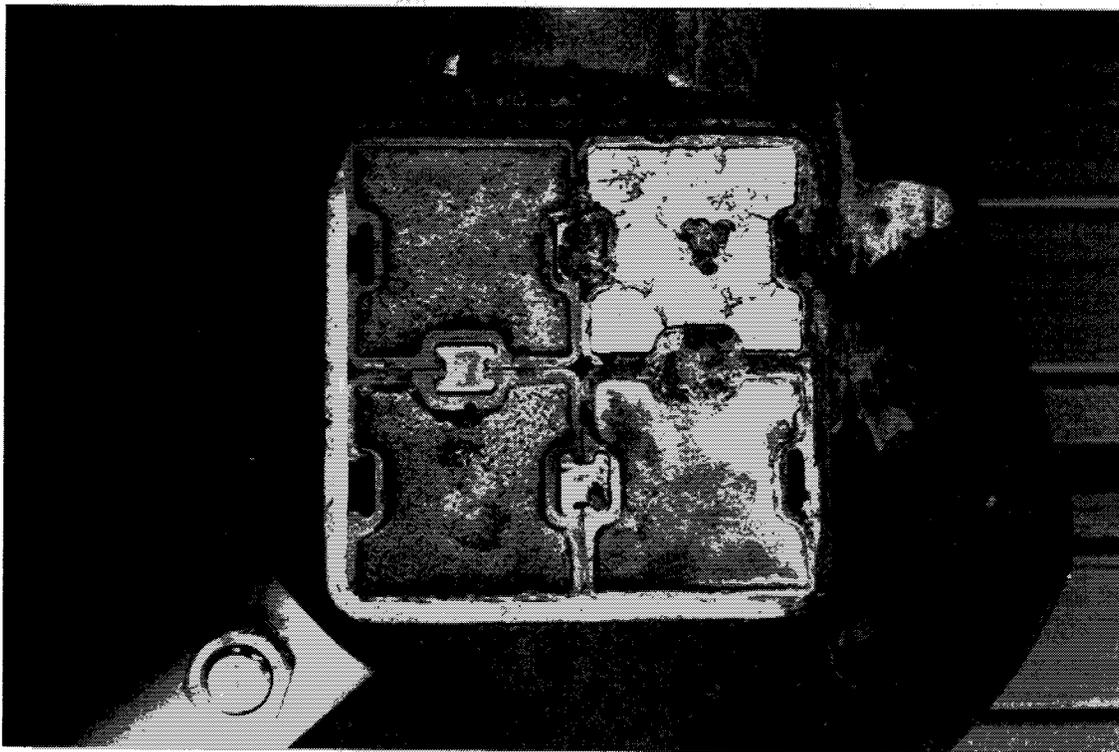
Toggle-Connected Crossbeam and Stay Cable Anchorage Connection
